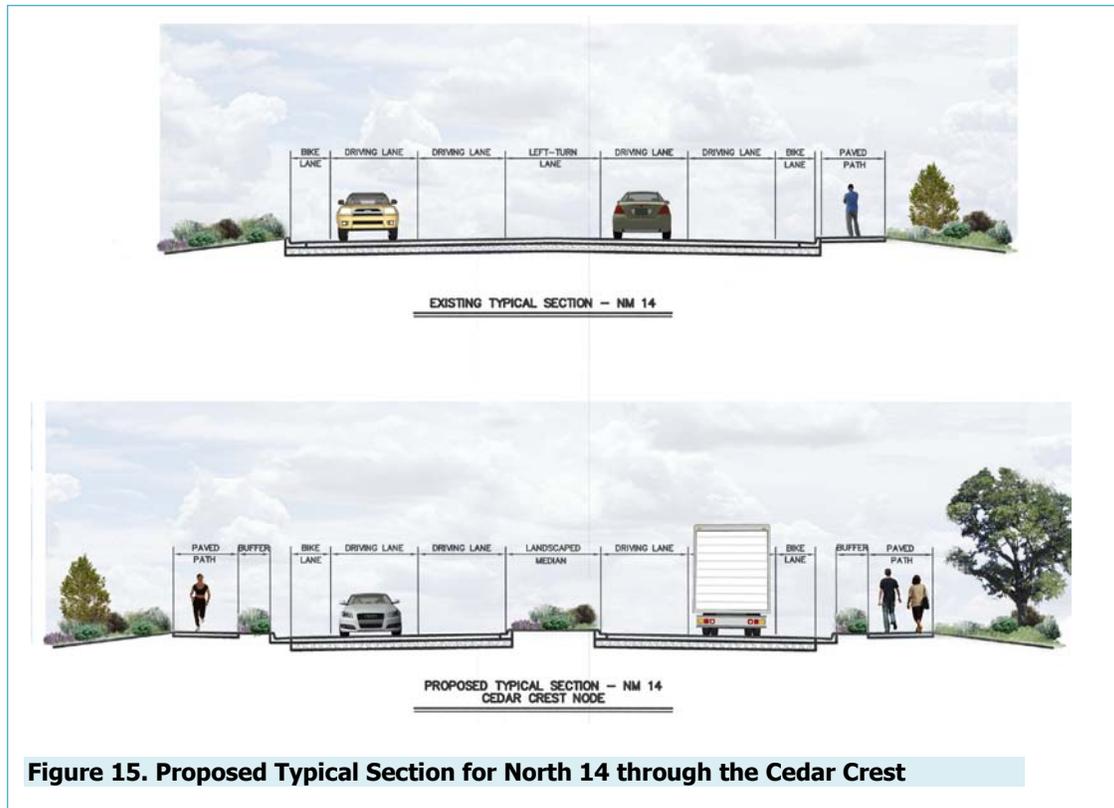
Proposed Typical Section for North 14 through the Cedar Crest
